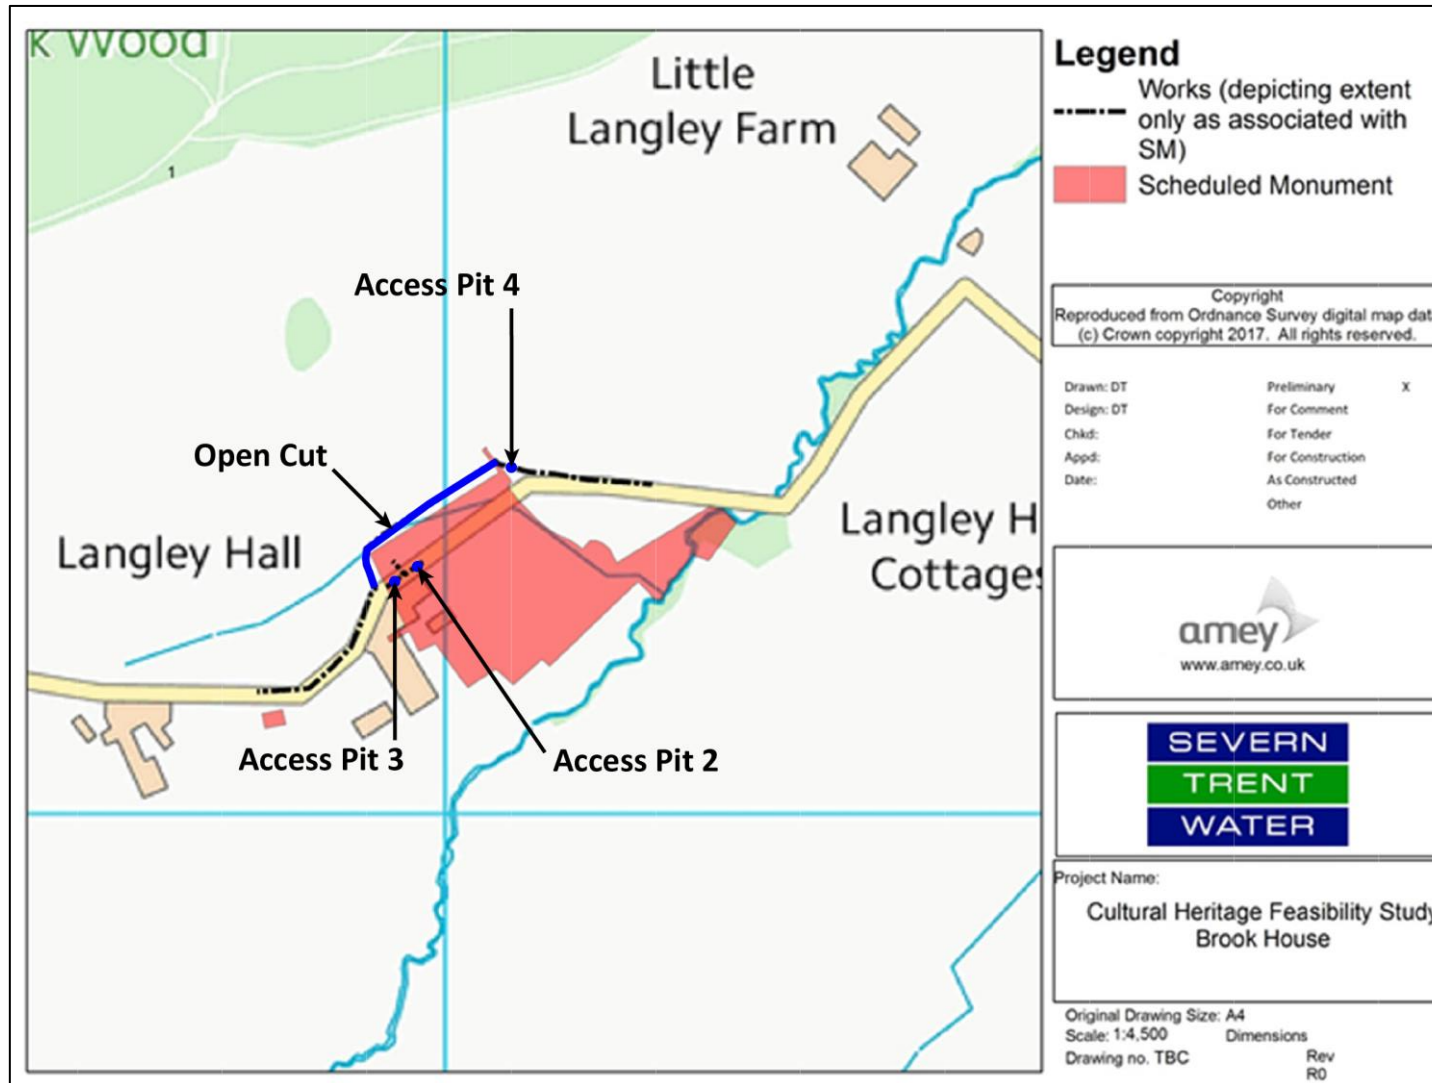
Plan showing location of groundworks, based on plan produced by Amey.
